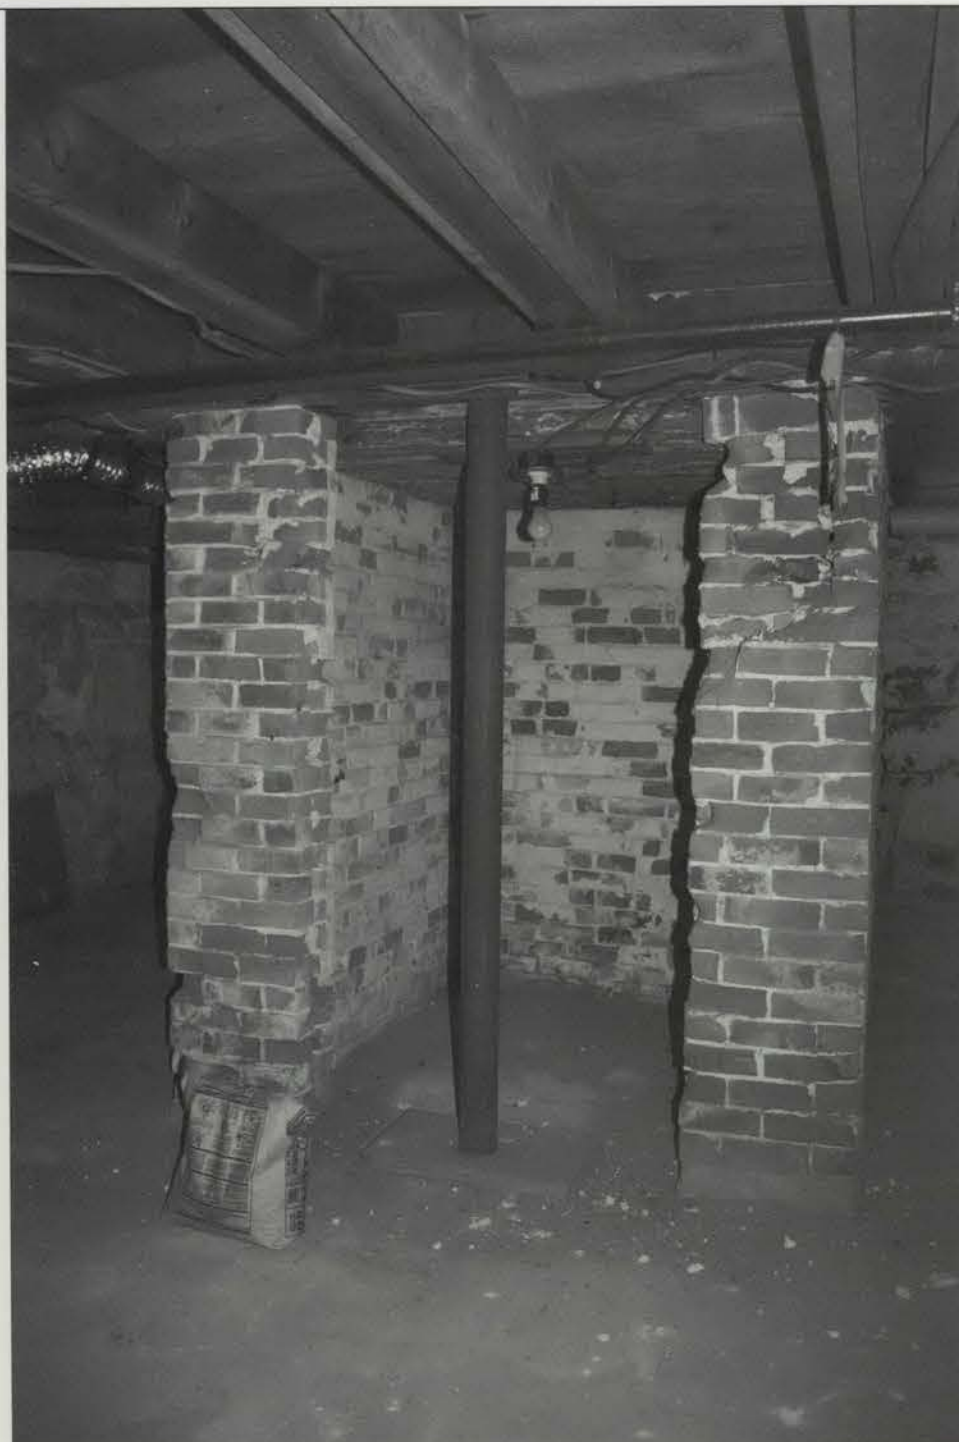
Steel lally column helping support failing brick foundation for kitchen hearth.
